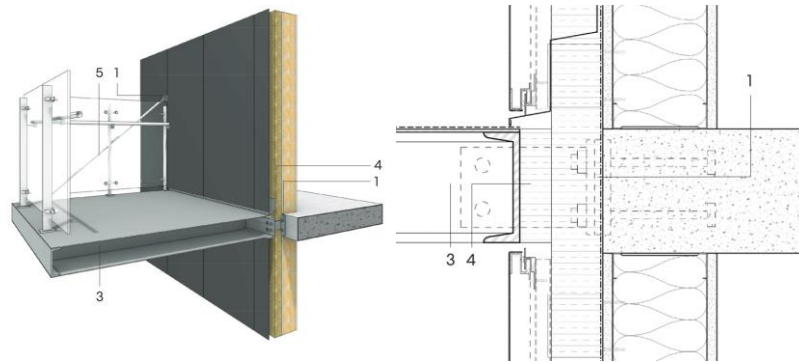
steel balcony (3) with thermal insulation (4), discrete connections (1) and structural tension rod (5)
